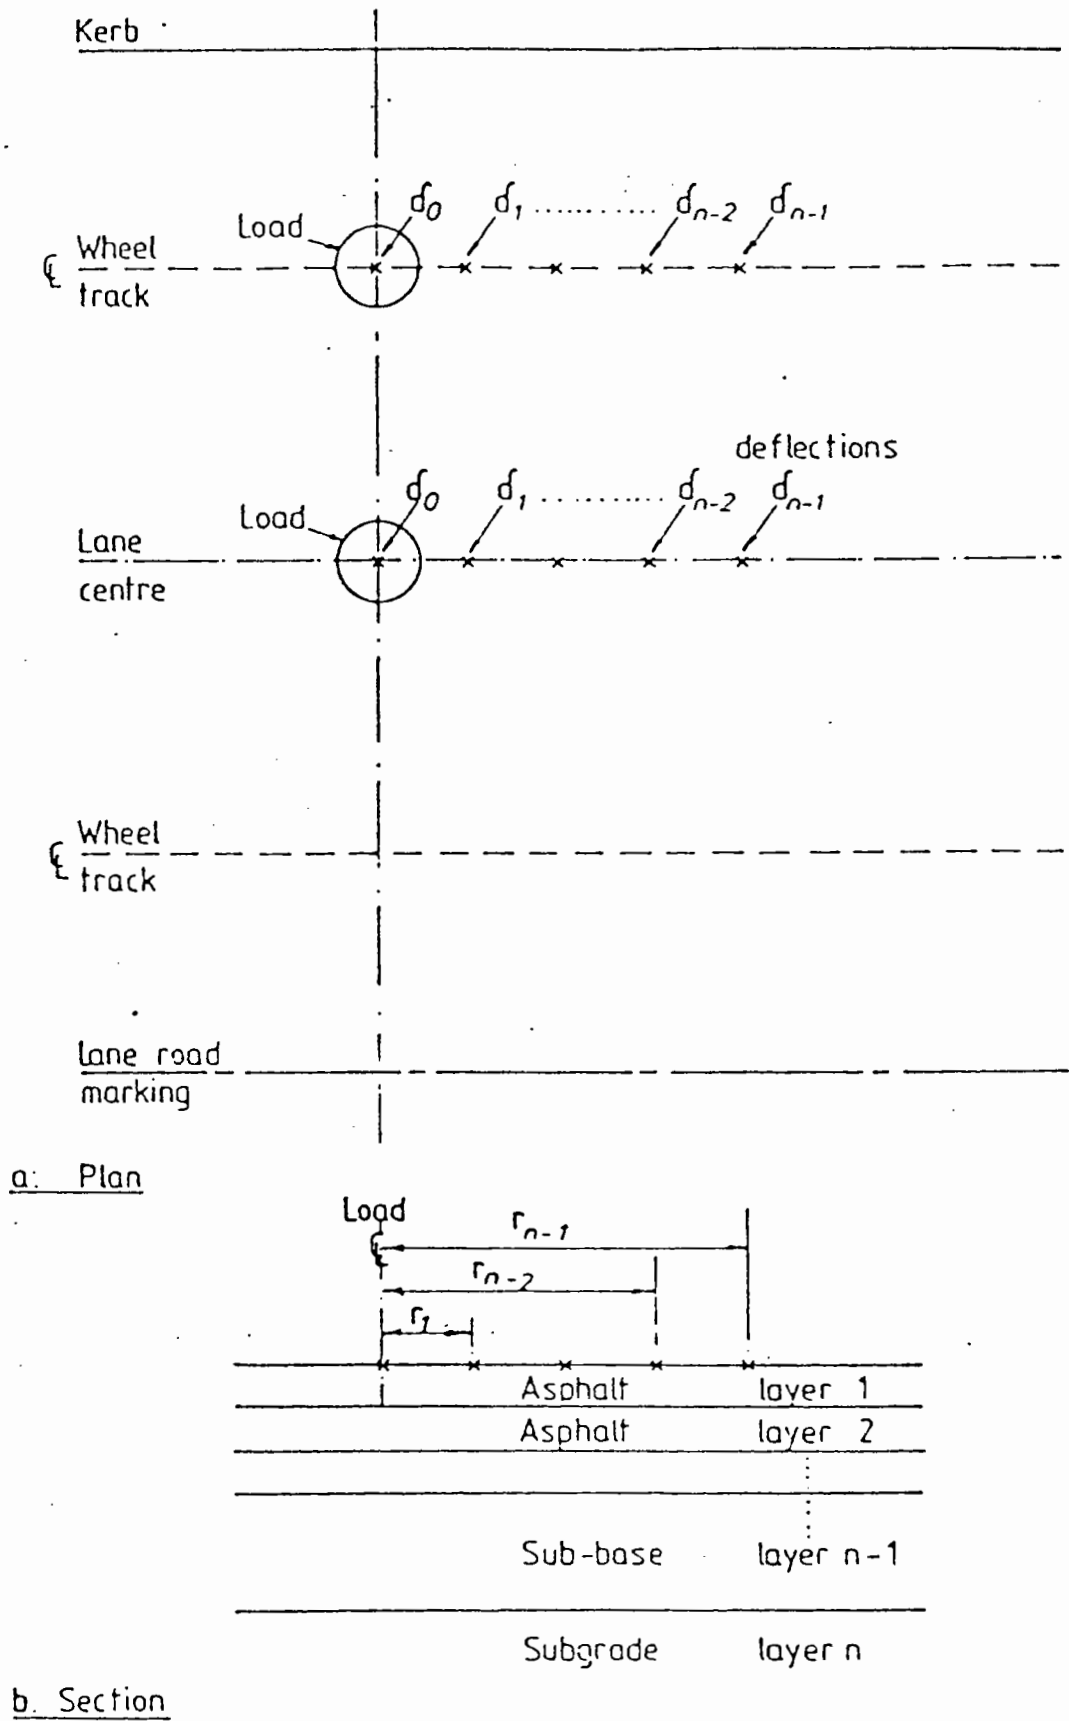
TYPICAL PAVEMENT STRUCTURE AND DEFLECTIONS FOR DEMOD(AFTER BRUNTON(63))
